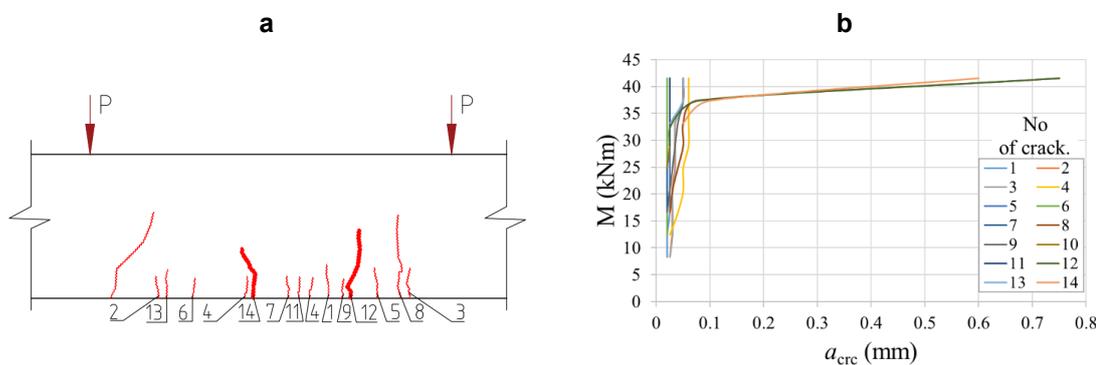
Crack pattern (a) and crack opening diagram (b) for beam SF2-250.
